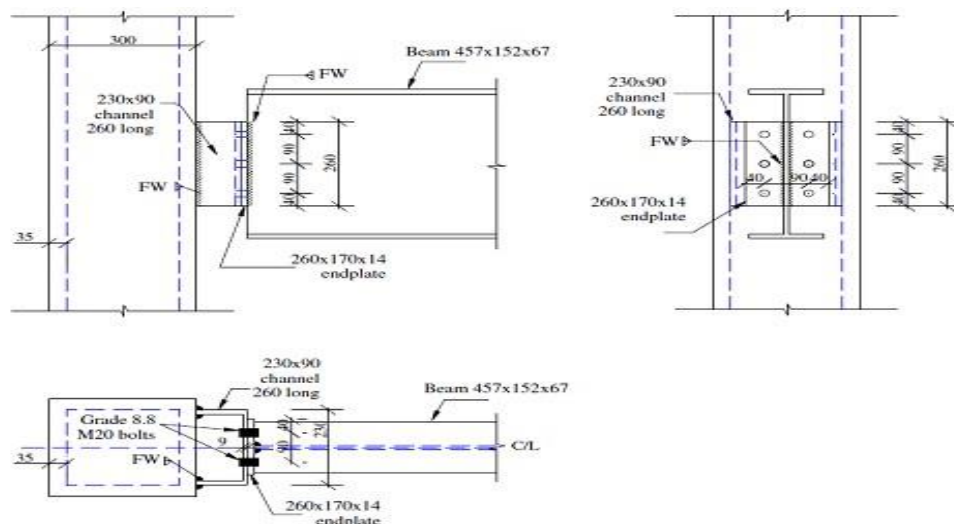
Basic geometrical details of flexible end plate connection to reverse channel
